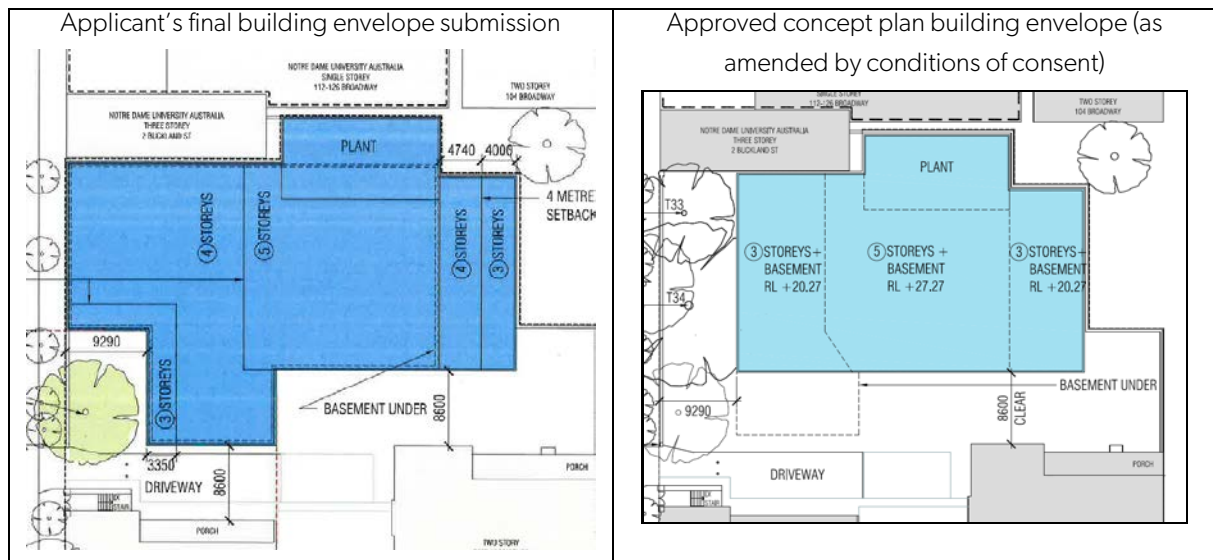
| Applicant's building envelope (left) and approved concept plan building envelope (right)
